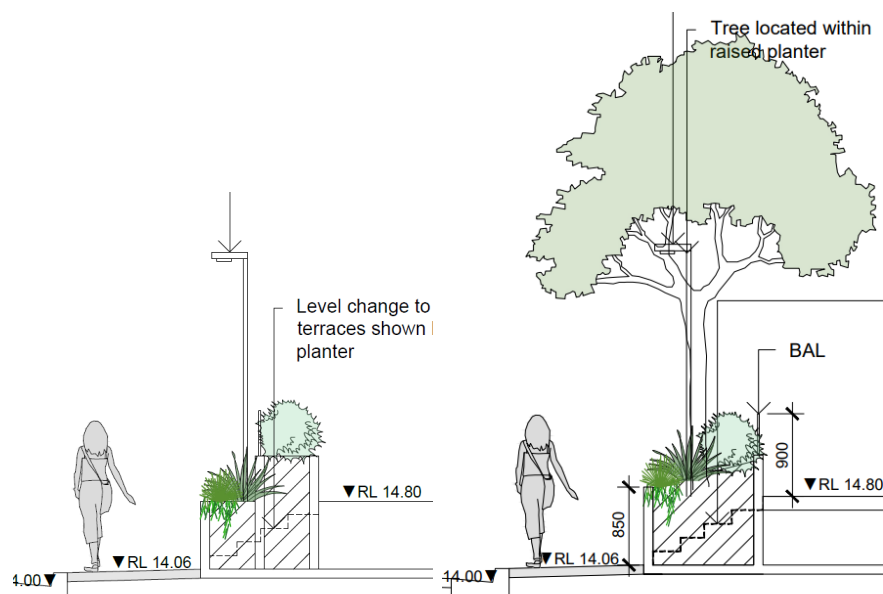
Comparison of Original and Amended On-Structure Landscaping Adjacent to Private Road/Driveway
